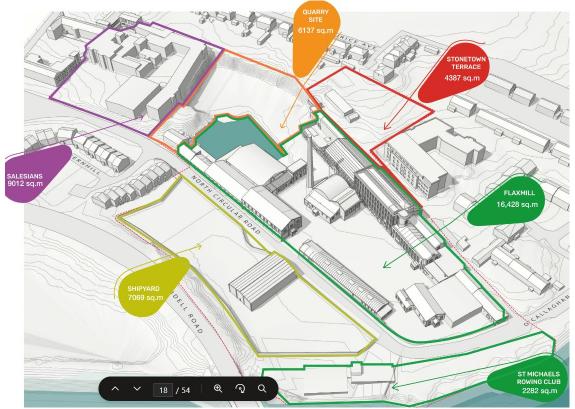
Six Development Zones with the Overall Masterplan Site
